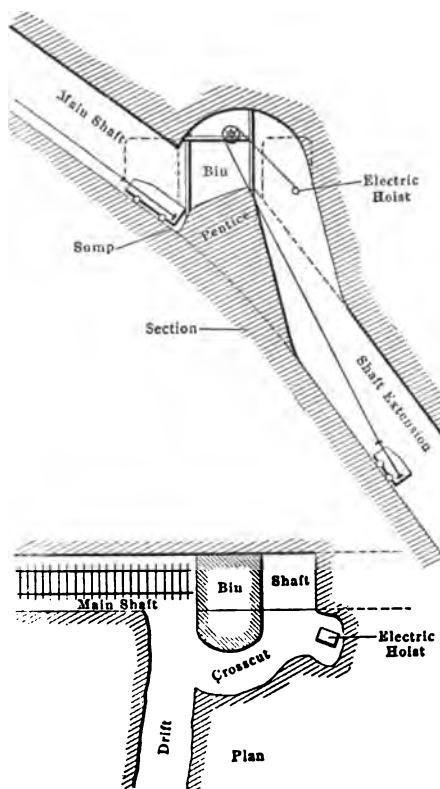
DETAILS OF ANNA SHAFT EXTENSION.
